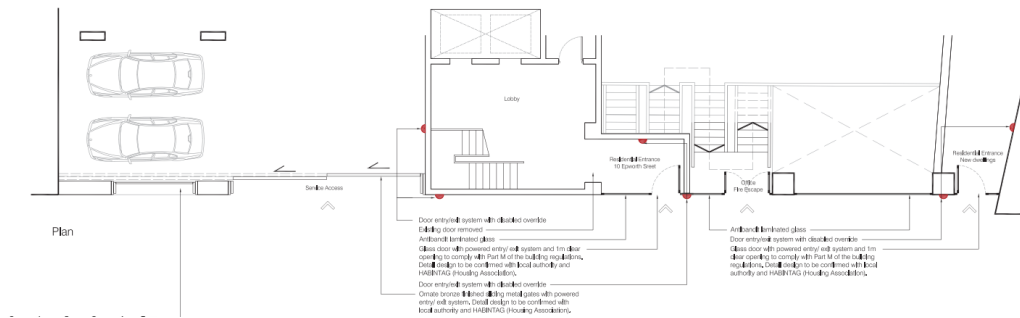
Proposed ground floor entrance to 10 Epworth Street
